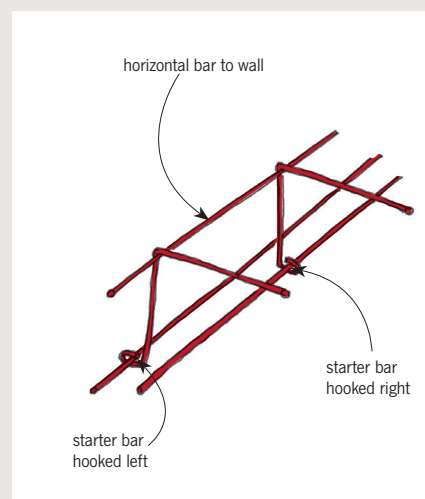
Starter bars hooked around bottom bars (wall and slab not shown).
